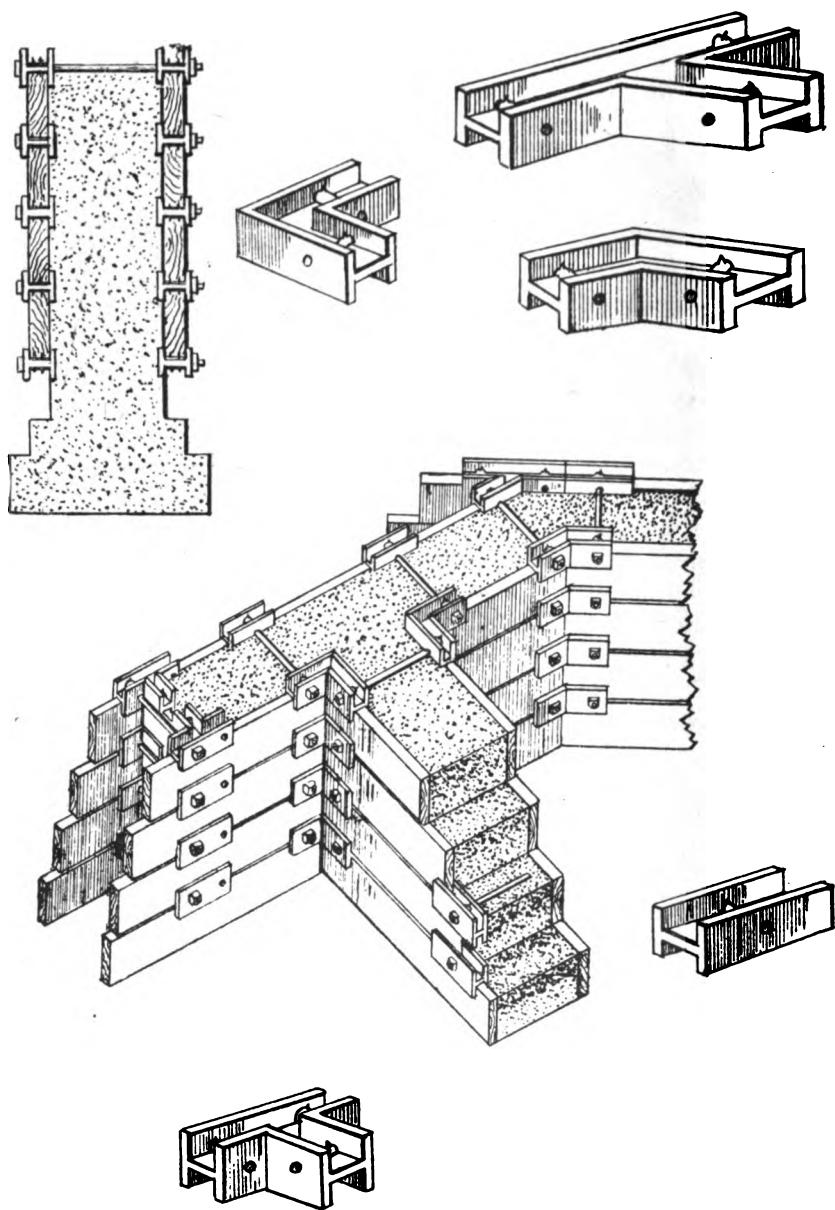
Farrell System of Molds for Concrete Wall Construction.
